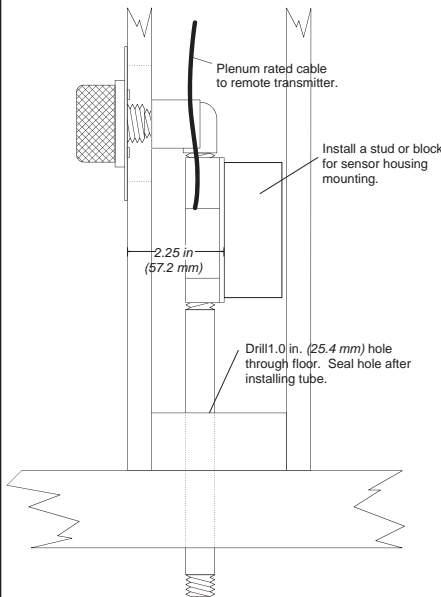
GB1 Underfloor Wall Mount Installation Detail
